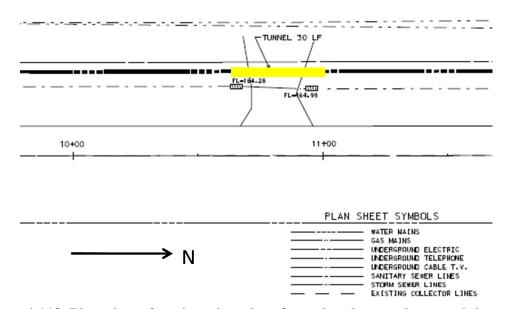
Plan view of project site taken from the plan set; bore path in yellow
